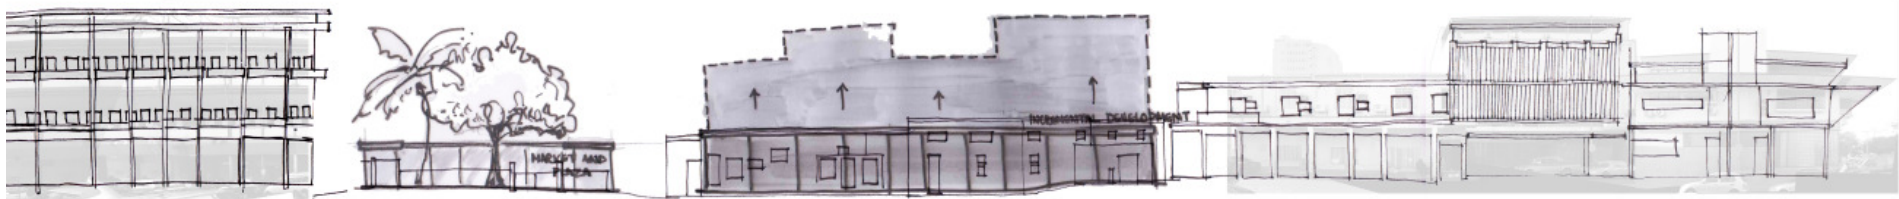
Drawing showing possible interventions as masses with the street view elevation on the southern facade. Drawing C.Filipe 2011
